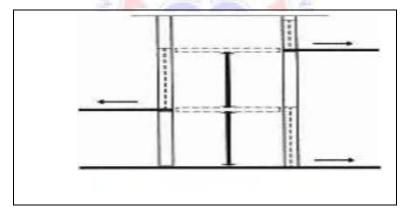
Lift placed in a closed structure with doors at accessible levels
